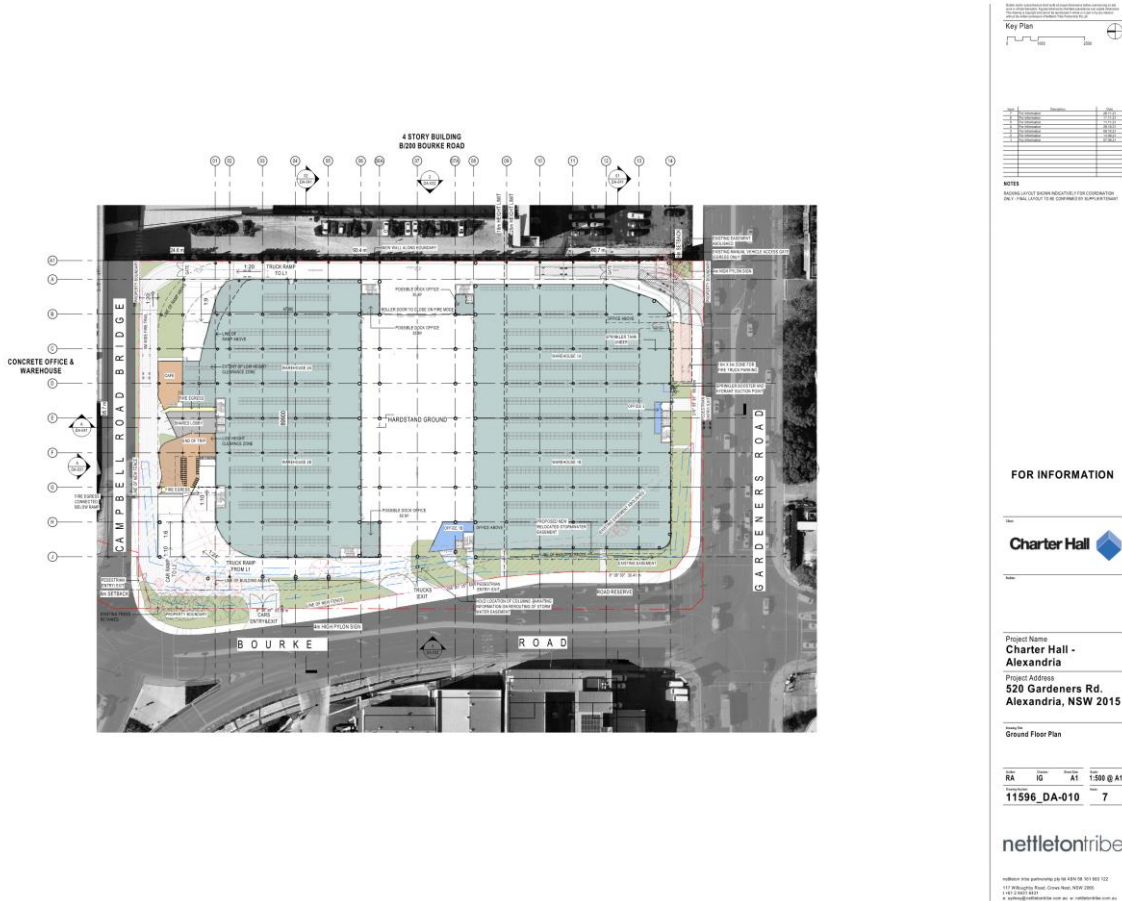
Development Layout (Source: Nettleton Tribe Architects)
